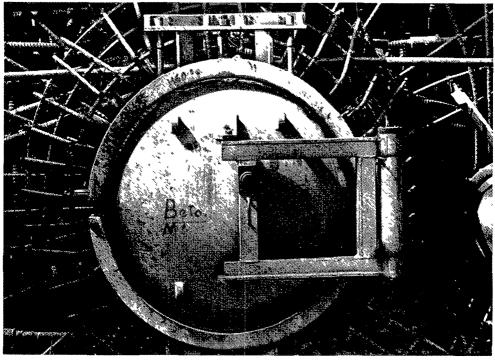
An access penetration surrounded by the network of steel reinforcing.
